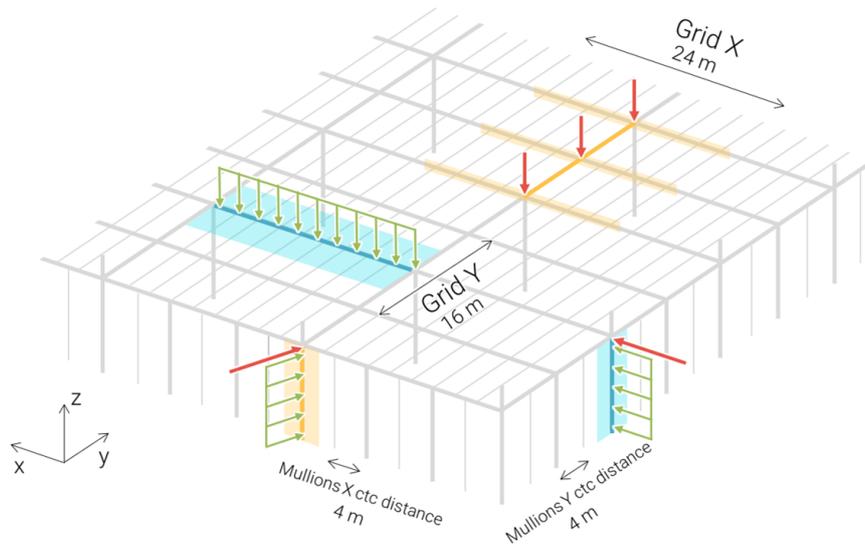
Surface loads on the roof and facades are converted to line loads and point loads in the 2D models. Loads on section (x) are represented in blue and loads on section Y are represented in yellow
